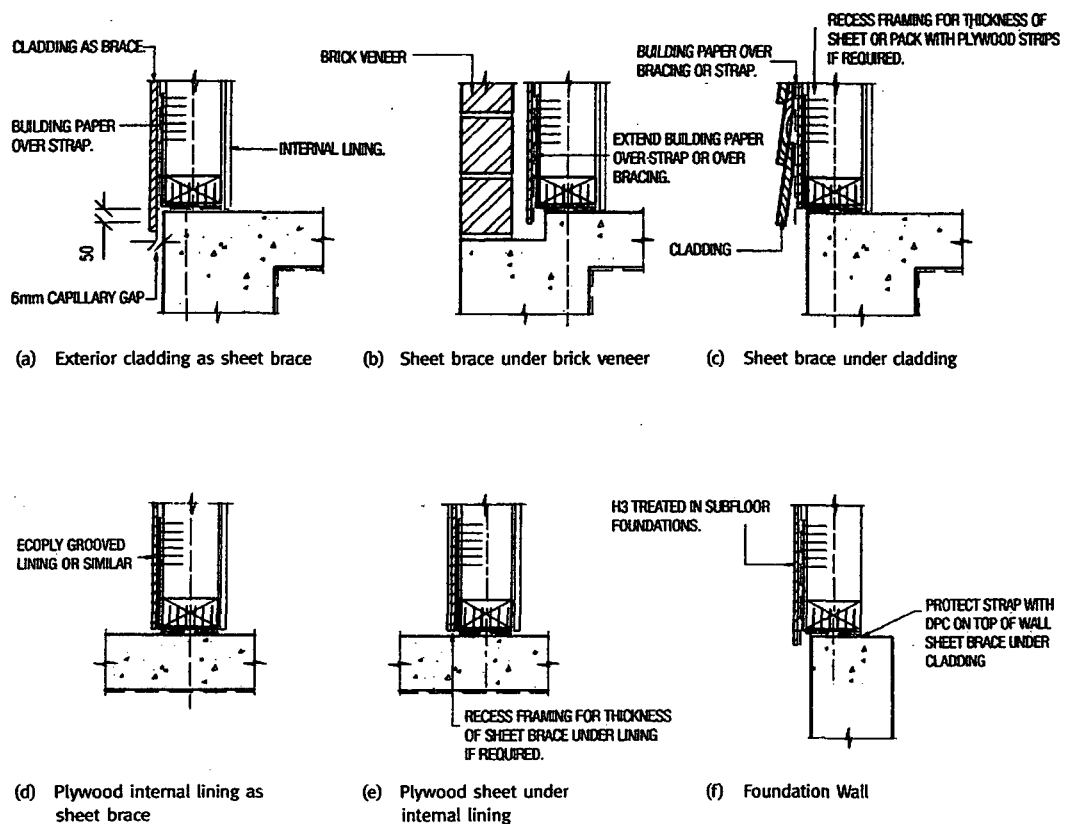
Typical detailing for wall and subfloor framing on concrete floor and foundations
